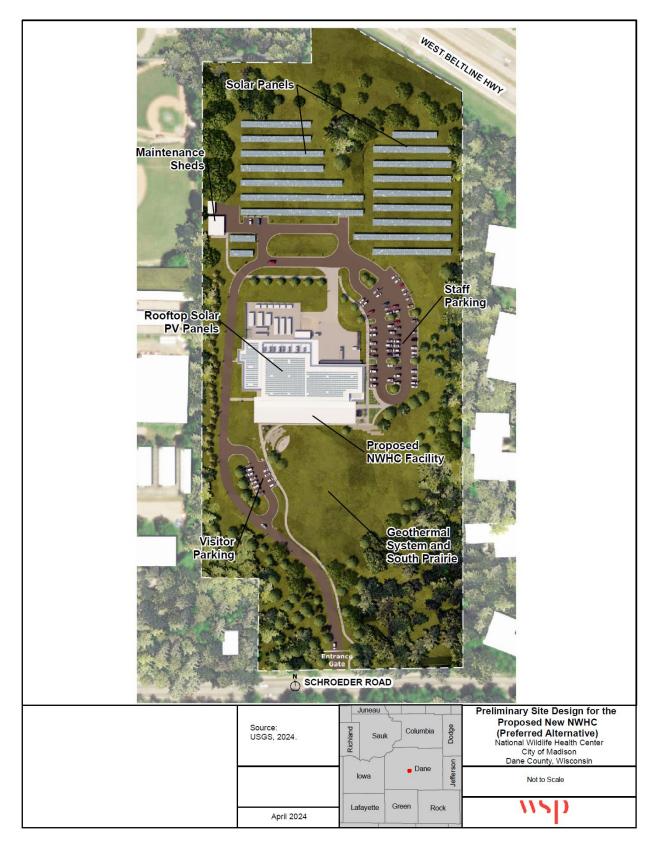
Preliminary Site Design for the Proposed New NWHC – (Preferred Alternative)
